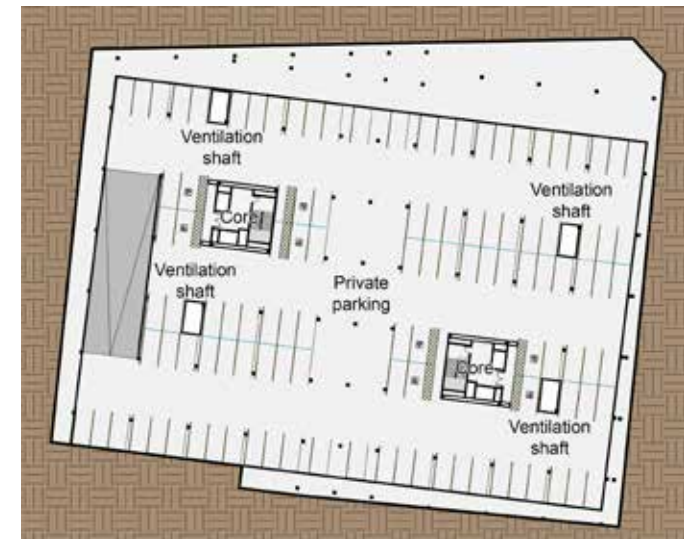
Basement parking levels B1 to B3 plan
